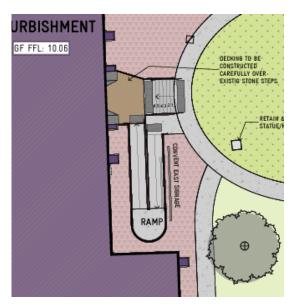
Extract of TP06 P2, showing the proposed plan of the new ramp, stair, and timber landing deck that connect to the Convent building's main entrance at the east façade. Source: Y2 Architecture, 2023.
